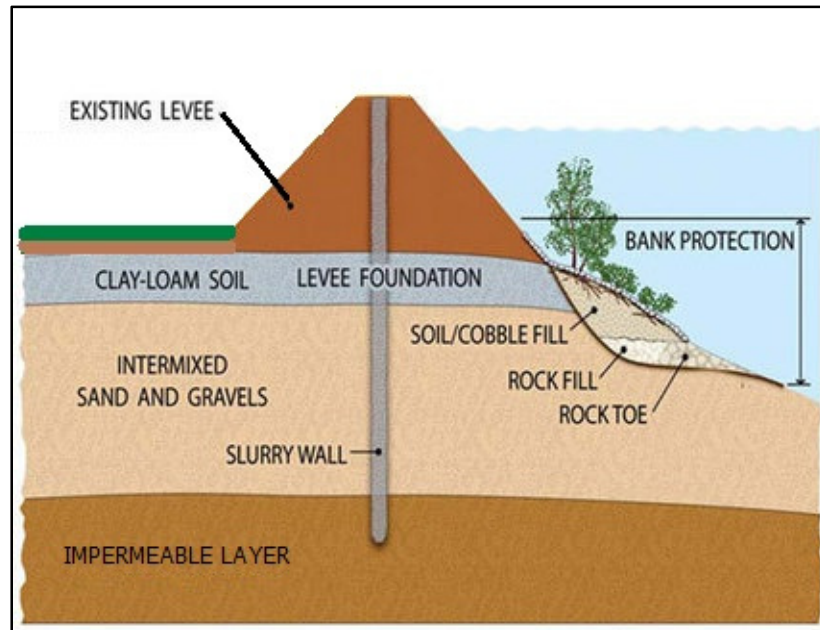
Levee with Cutoff Wall (adapted from Portland Cement Association)
